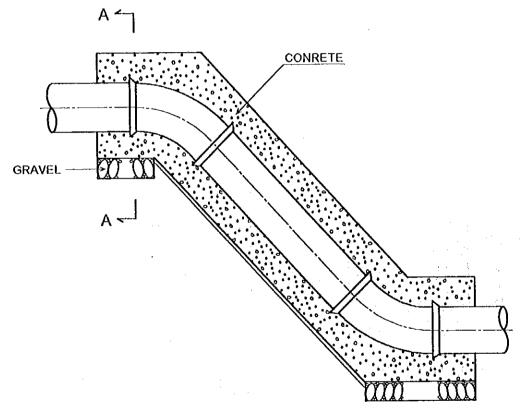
TYPICAL HORIZONTAL CROSS SECTION OF PROTECTION FOR 1/4 AND 1/8 BEND
